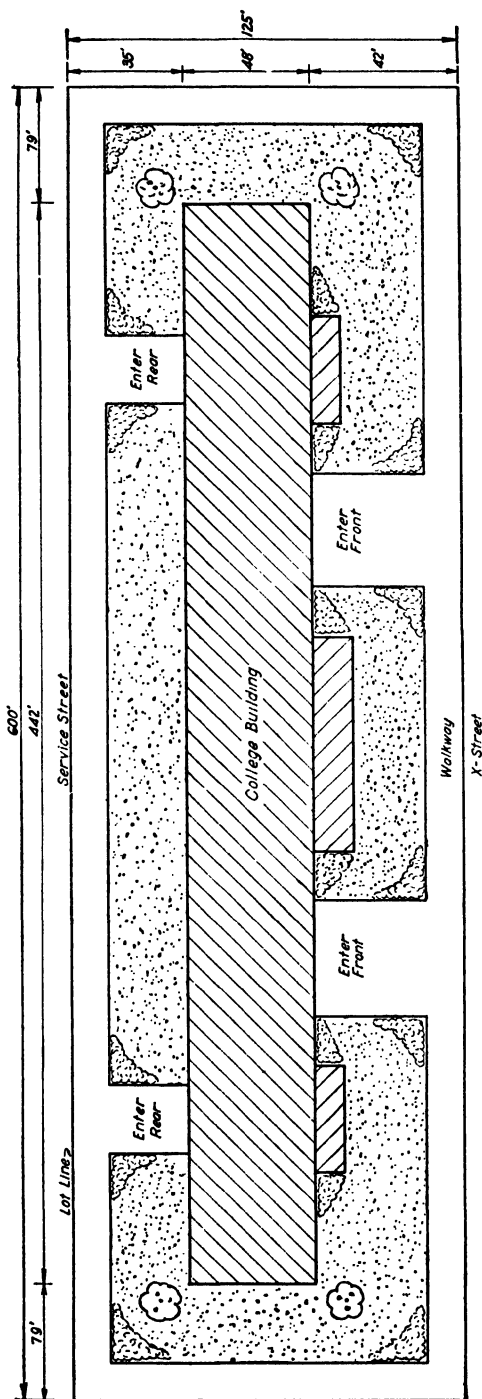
GROUNDS PLAN SHOWING BUILDING, WALKWAYS, AND PLANTING.
